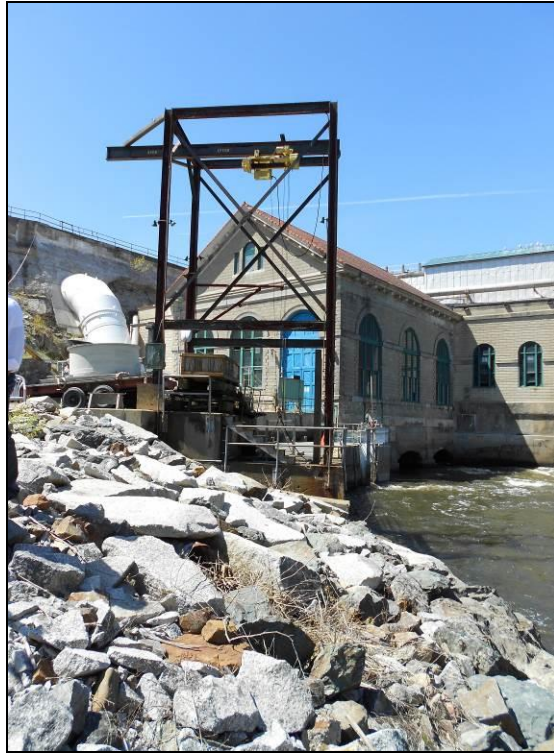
Ellsworth Dam Powerhouse and Fish Lift
